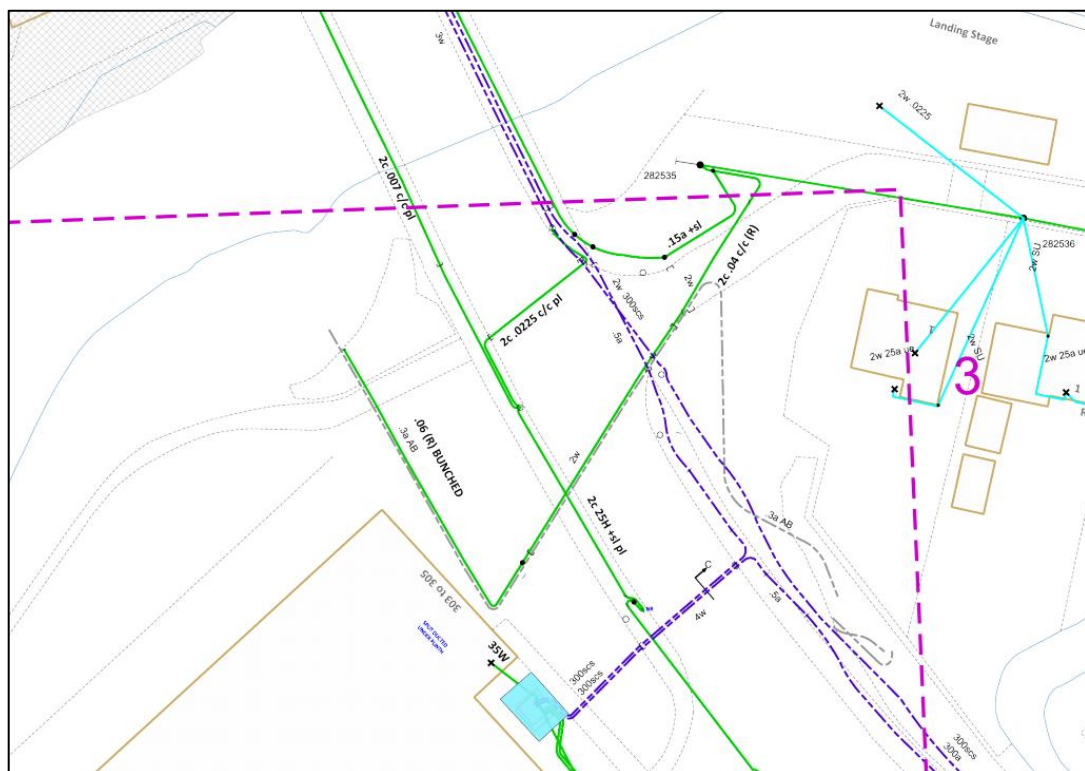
UKPN Stats Plan Vale Road. Plan from UKPN
